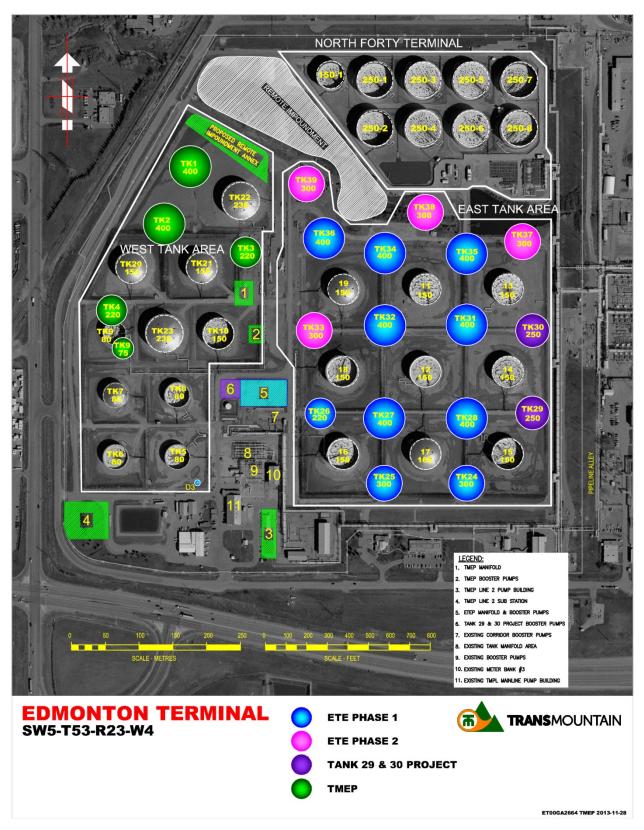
Edmonton Terminal Proposed Plot Plan
